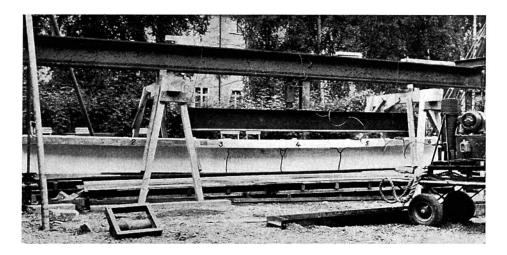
Crack Distribution in the Non-Grouted T-Beam (T).
